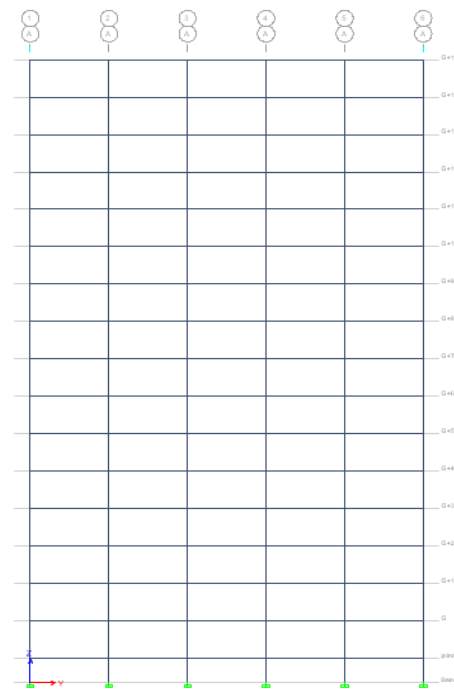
elevation of structure-1 resting on 00 ground slope
